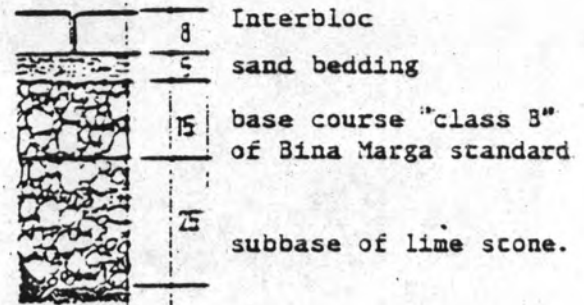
Pavement structure between stations 0+352 and 0+483
